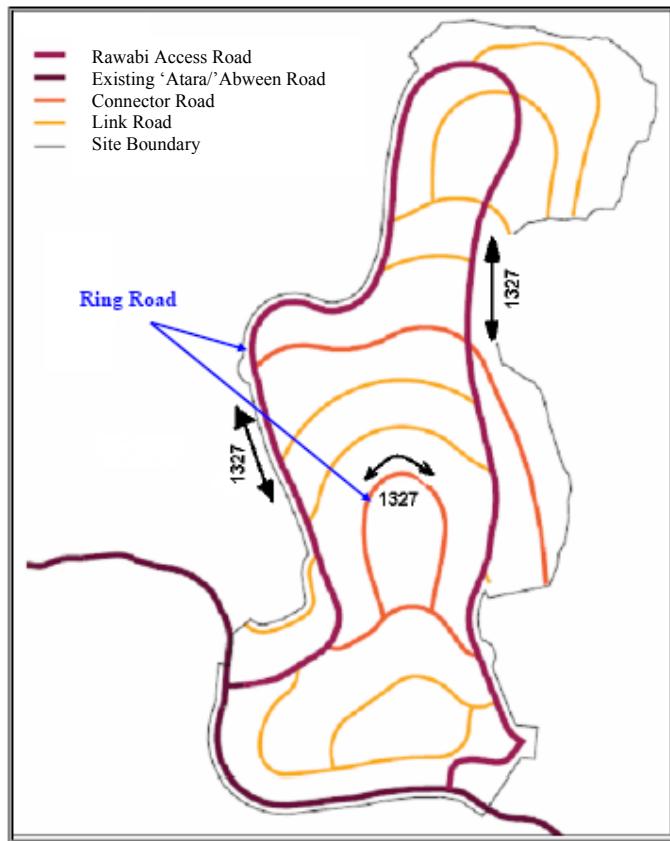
Rawabi 1 planned road network (Source: RMPR)
